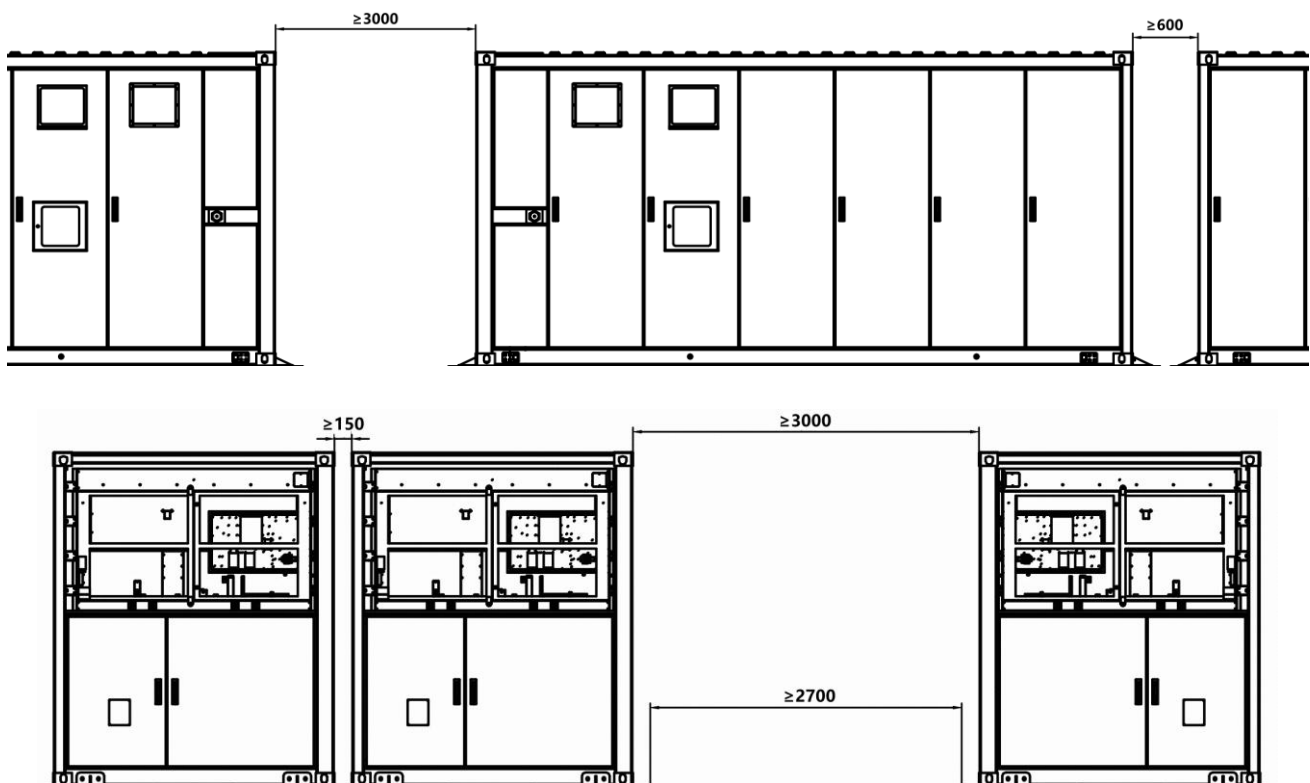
Installation Space Requirements for Multiple Container A and Container B Units (mm)
